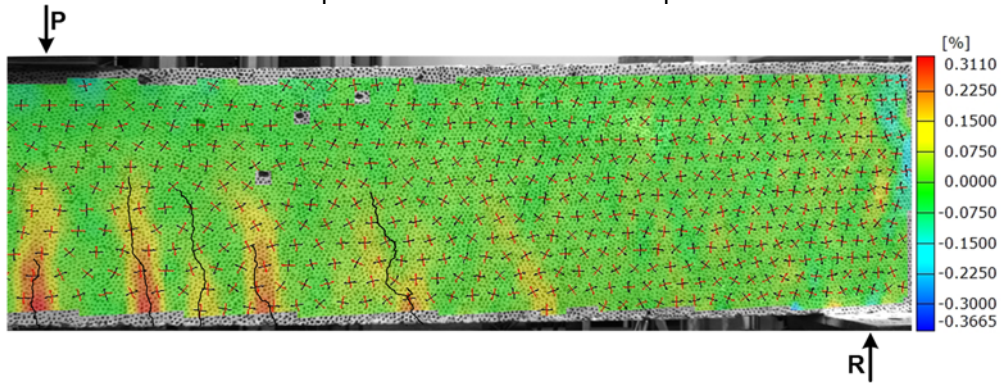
Full-field concrete longitudinal strain ( $\epsilon_x$ ) across shear span for specimen RC18a at load 40 kips
